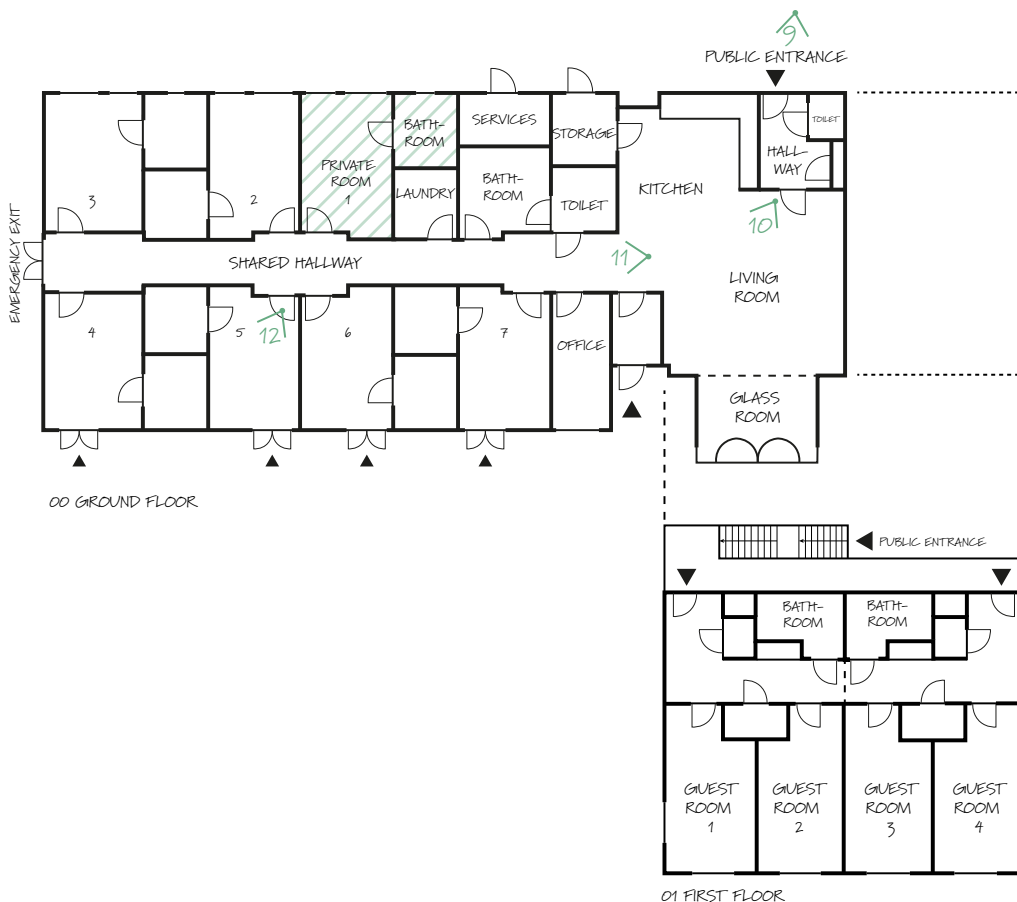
Visualisation of floor plan residence building, own sketch (2023).
